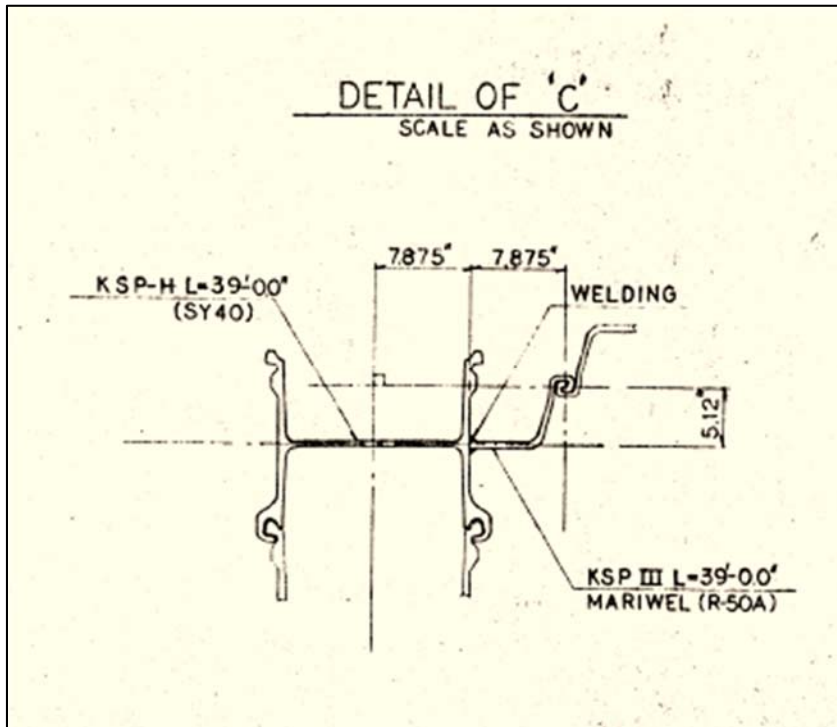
Detail C from Pertinent Document 2 details the corner connection of the front face KSP III sheet pile line to the south face KSP-H pile, at the southwest corner of Berth 1. The mirror image of this arrangement is seen in Photo 6 and Photo 7.
